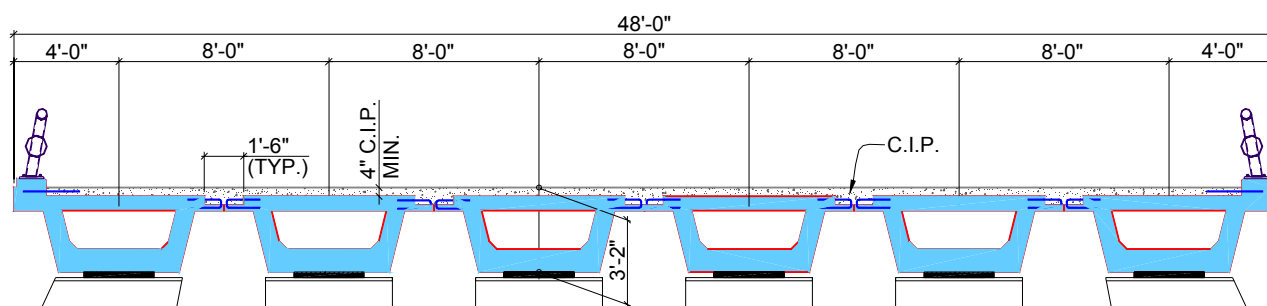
Transverse Section of "Pre-topped U-beam" Bridge Alternate
